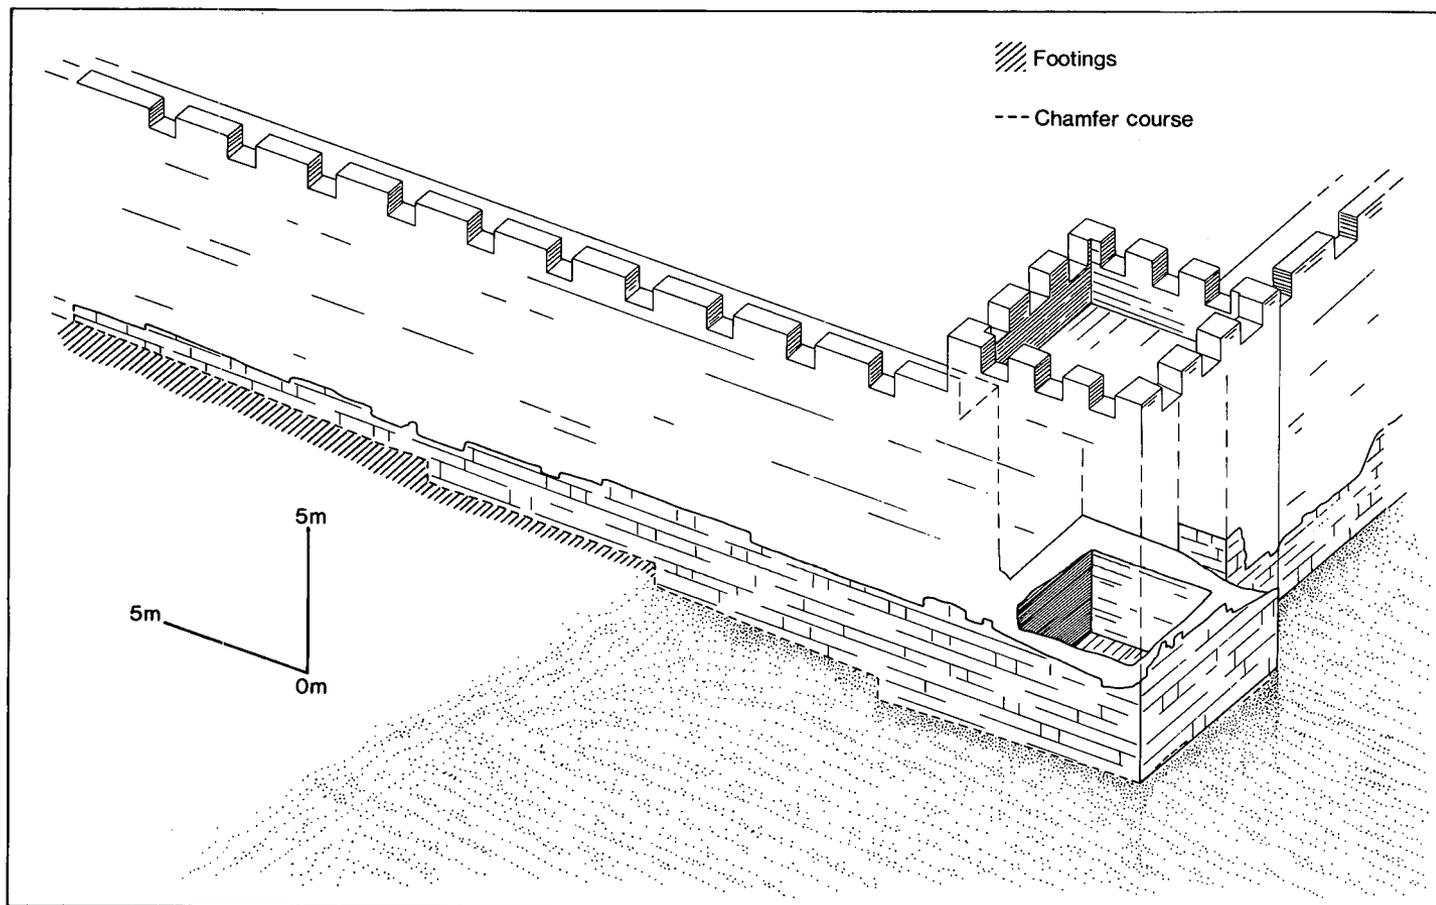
Axonometric reconstruction drawing of the Town Wall and Tower.
